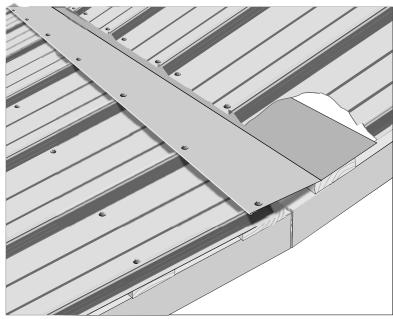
The pitch break provides a continuous drainage where two slopes meet.
